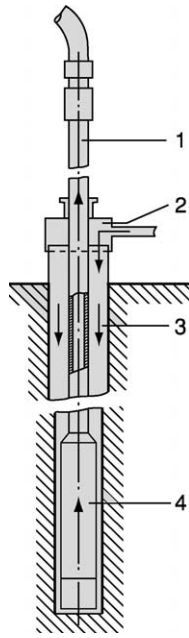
Detail of reverse circulation flushing drill. 1, Drill stem; 2, flush head; 3, casing; 4, core drilling string.
